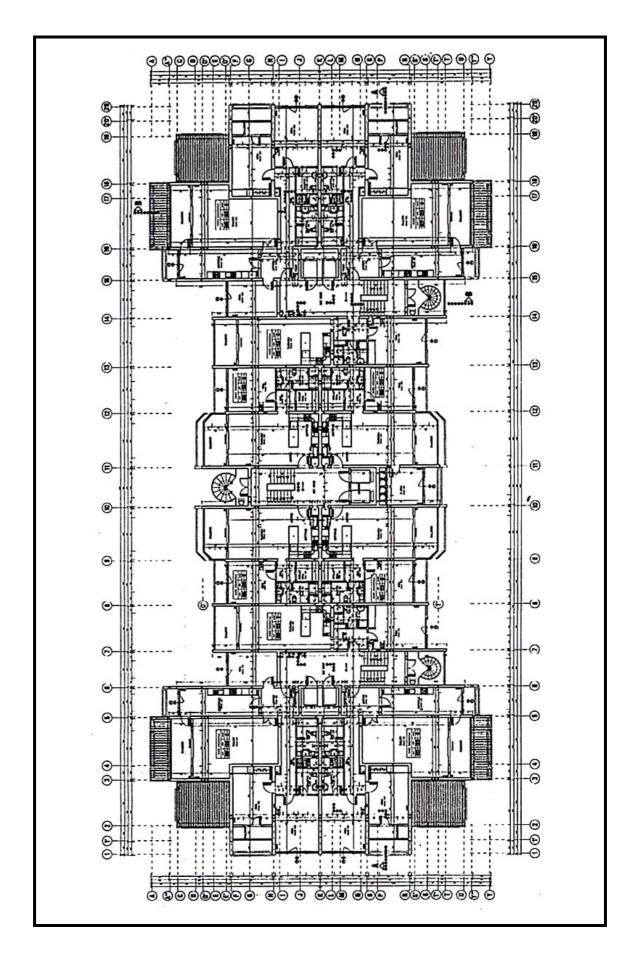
Mavişehir II; Kuğu 16th – 17th Floor Plan
